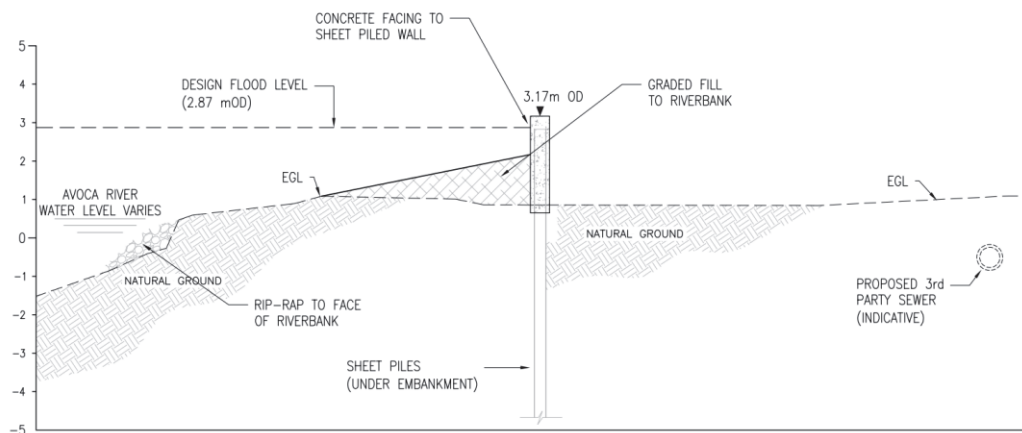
Section through sheet pile with RC cap. Not to scale
